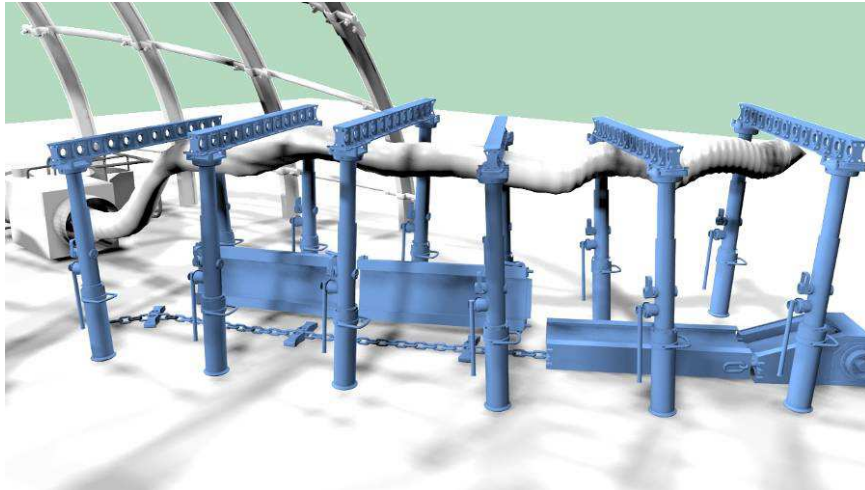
The first group of rescue supports enabled to start of mounting conveyor
